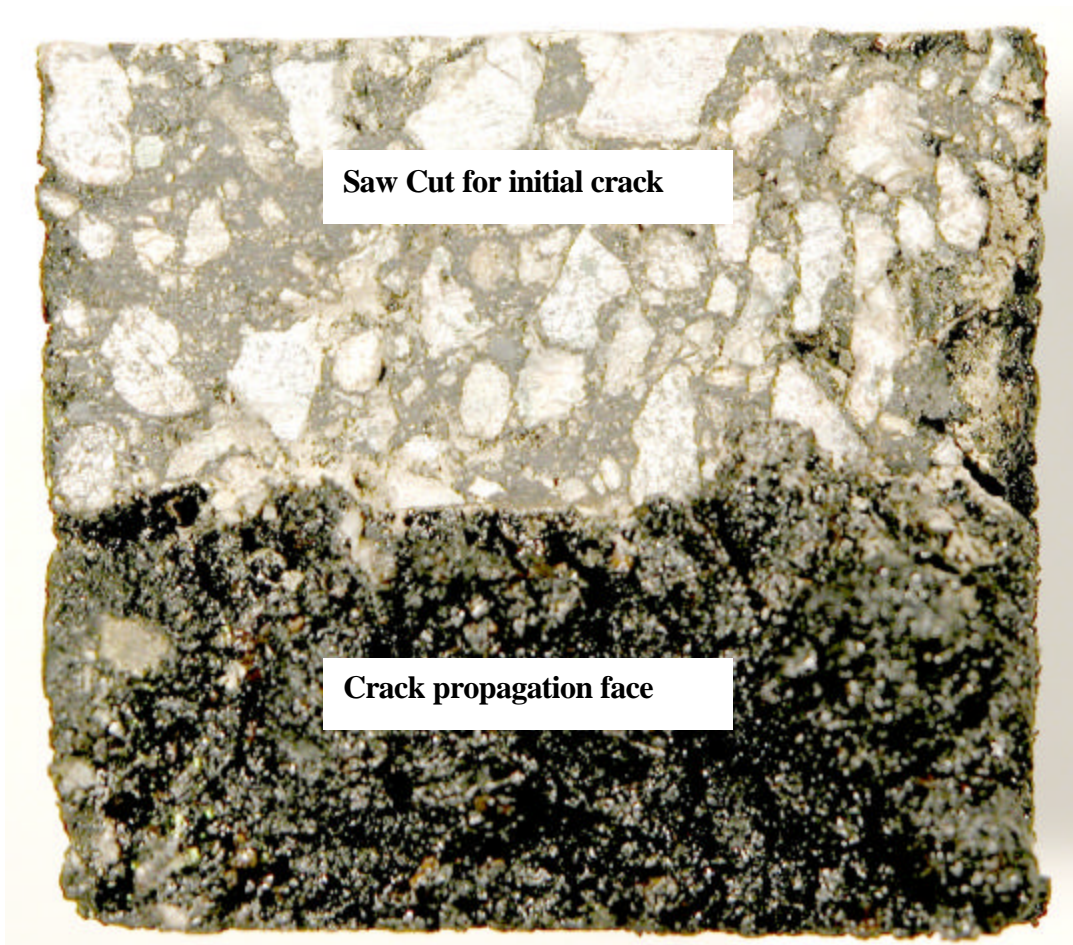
Crack face and fracture surface obtained from quasi-static fracture test.
